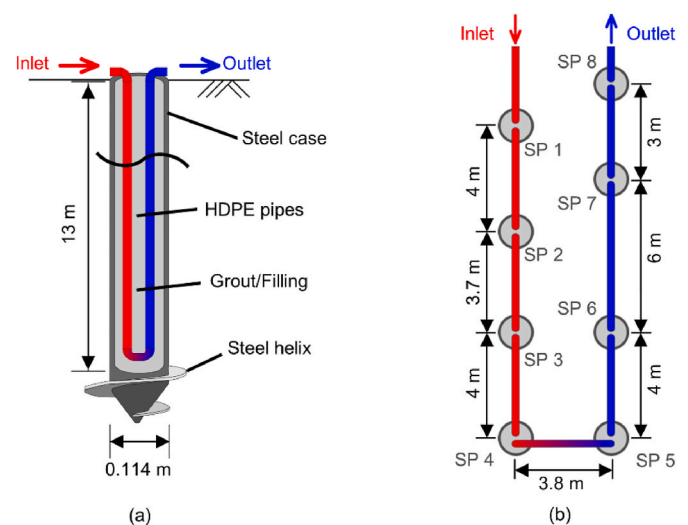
A typical energy screw pile: schematic vertical cross section (a), and plan view of the screw pile group in Melbourne (b).
